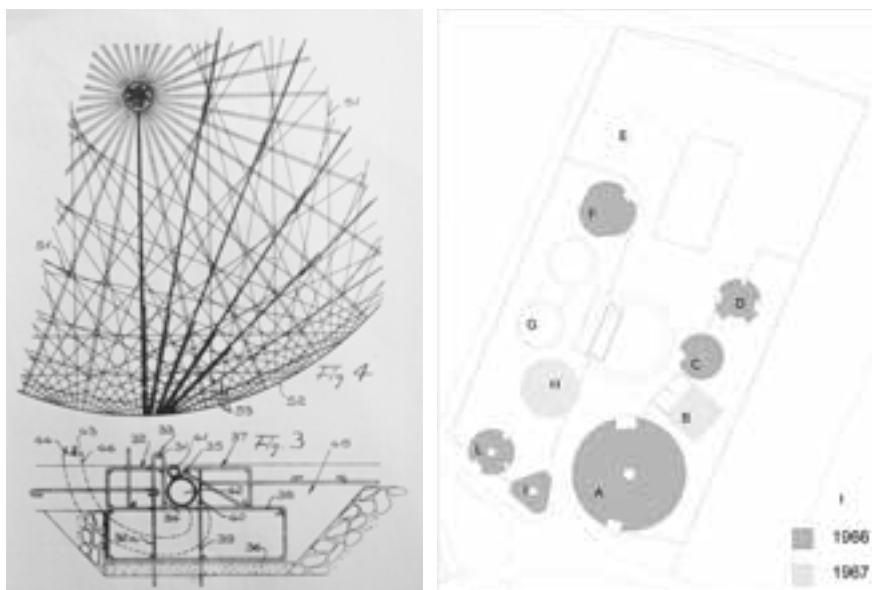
Dante Bini, the Mushroom field, San Cesario sul Panaro, Italy, Patent n. 853736, Expandable reinforcement design and foundation ring section detail. © Archivio Centrale dello Stato, Roma.
